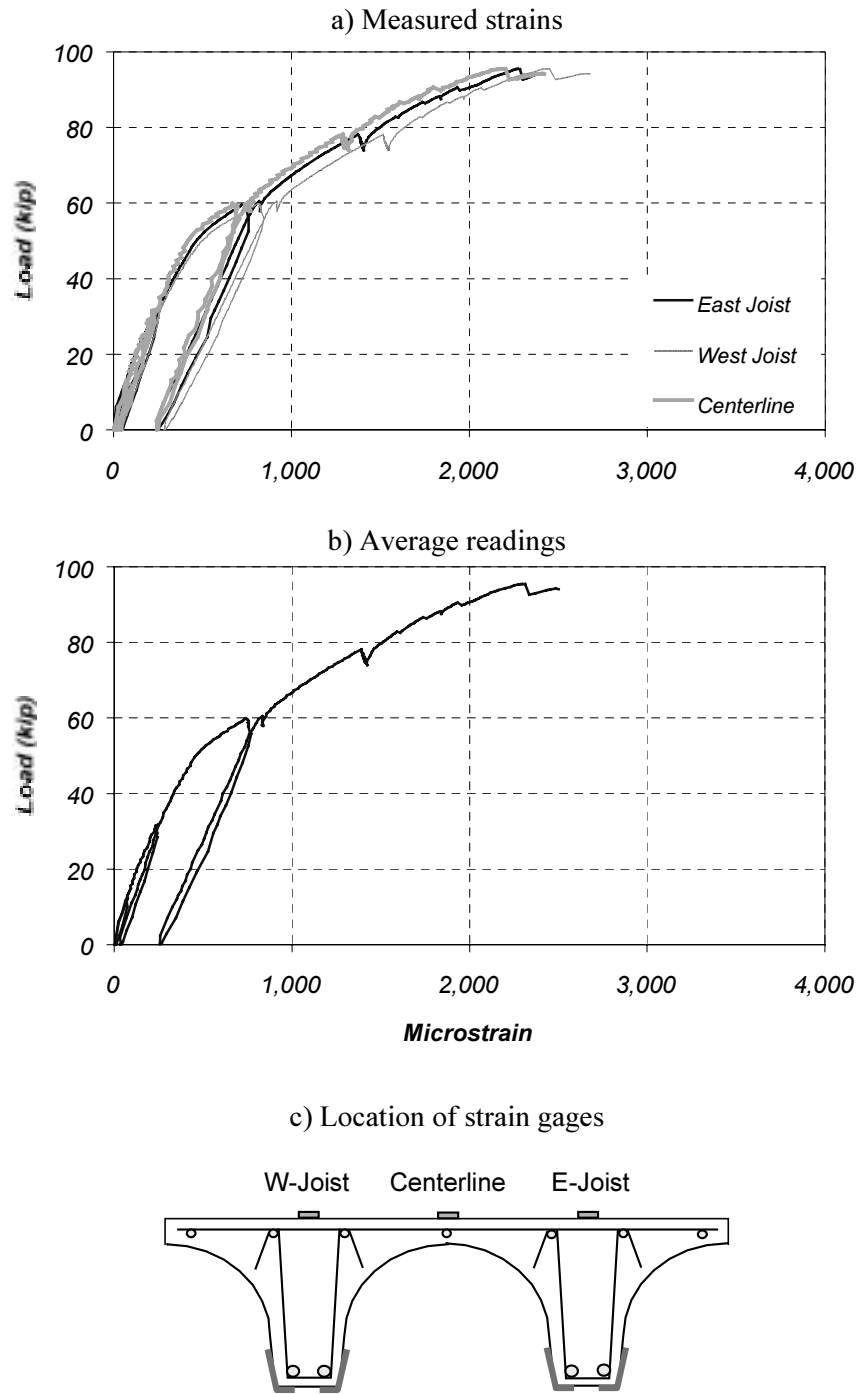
Measured Strains on Concrete Slab in Specimen J-2 (Section N1)
